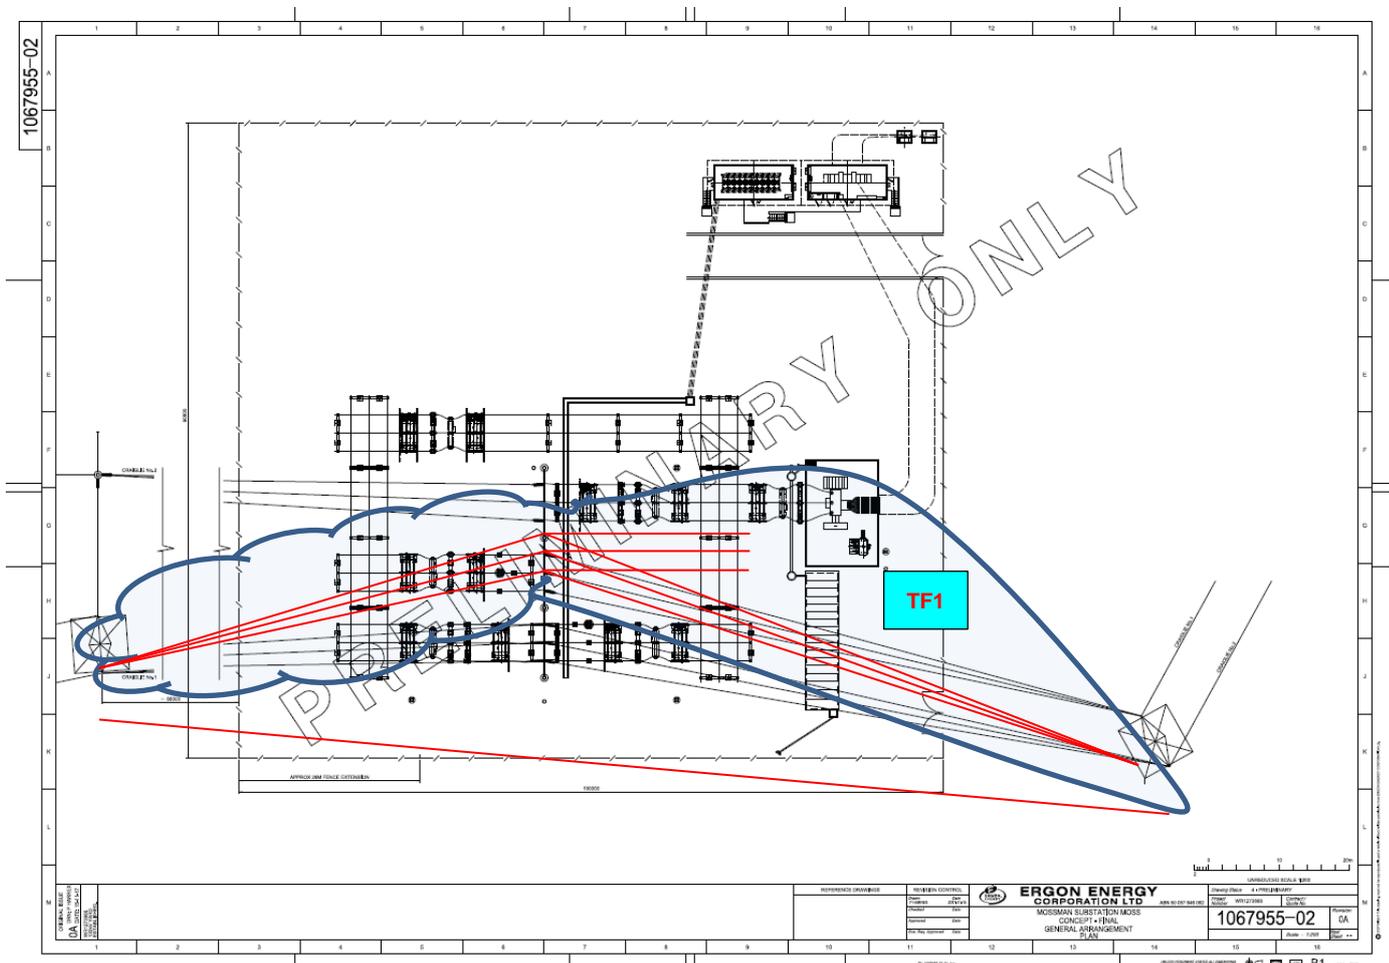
Stage 4 Final General Arrangement of 132/22 kV Substation with Proposed 132 kV Substation Overlay to be modified to include only a single landing span and 132 kV bus tee to TF1 132/22 kV OLTC.
